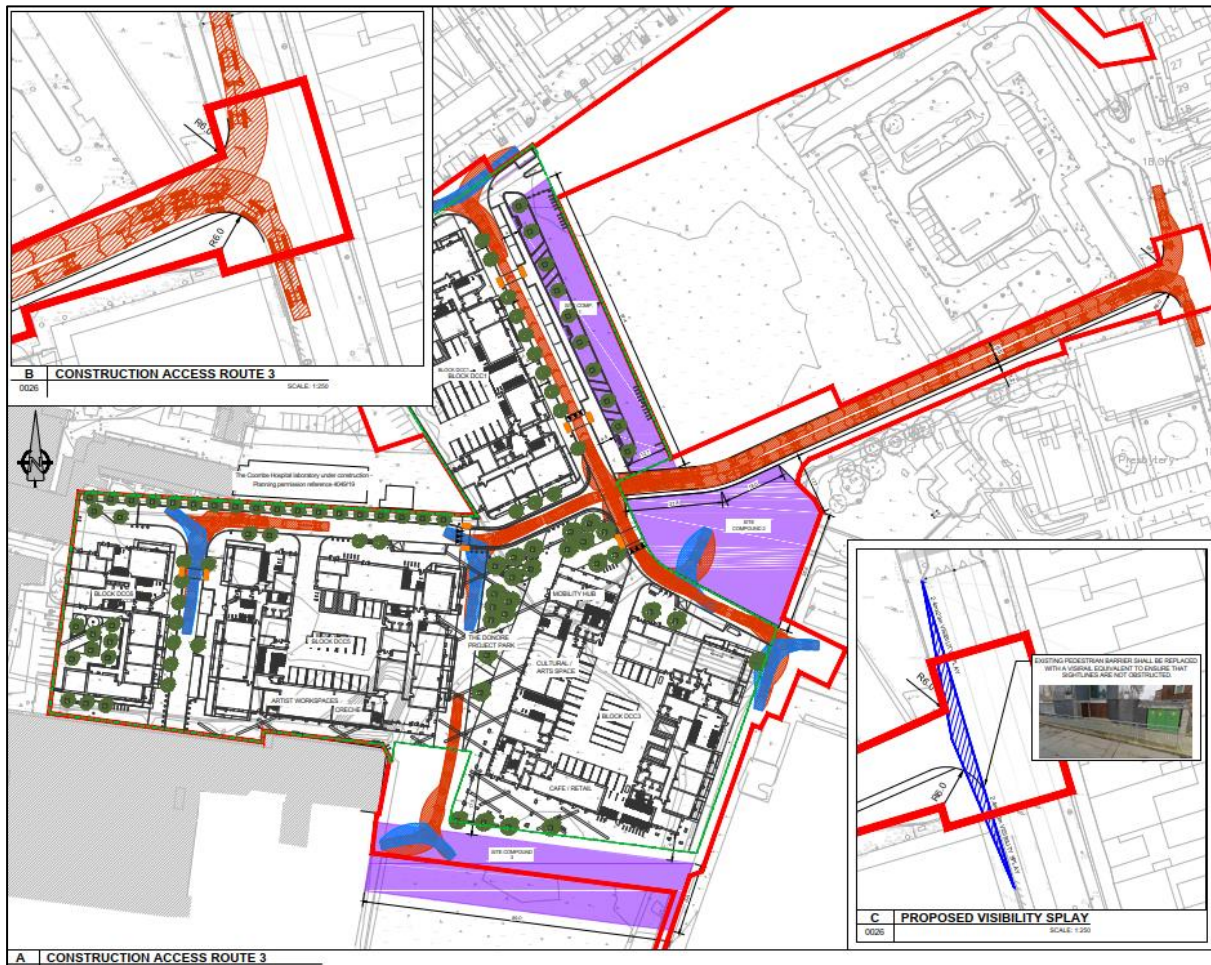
Construction Access Route (AECOM Drawing: STG-AEC-S1b-00-00-SK-C-0000026)
